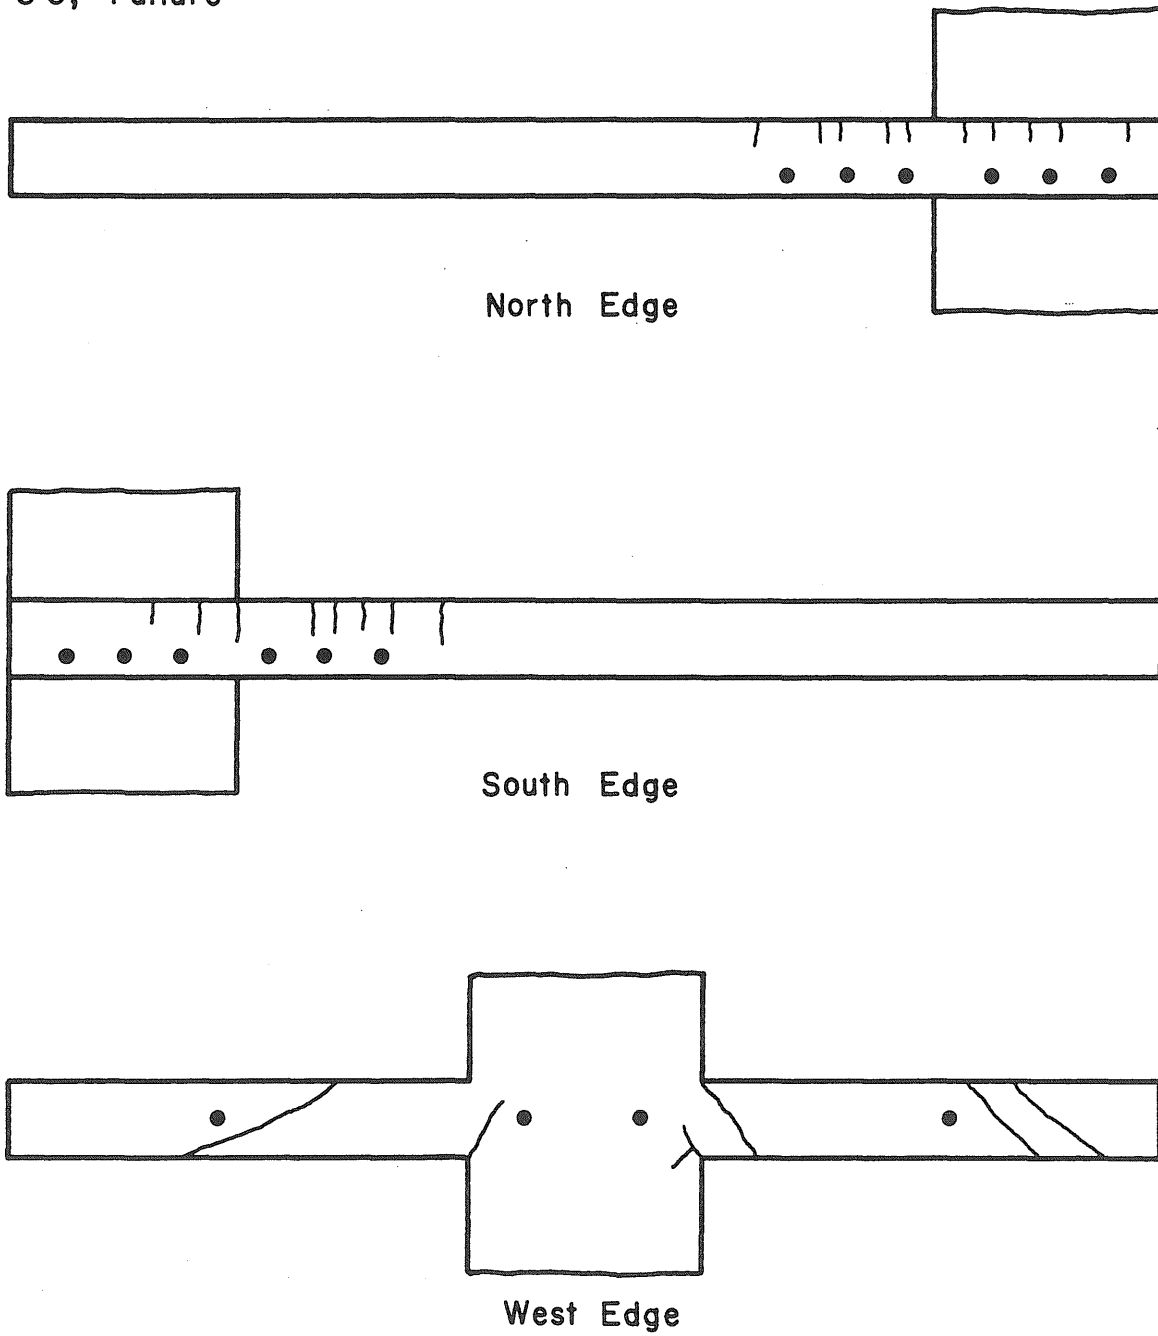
Crack Pattern at Failure on the North, South and West Edges of Specimen S3
